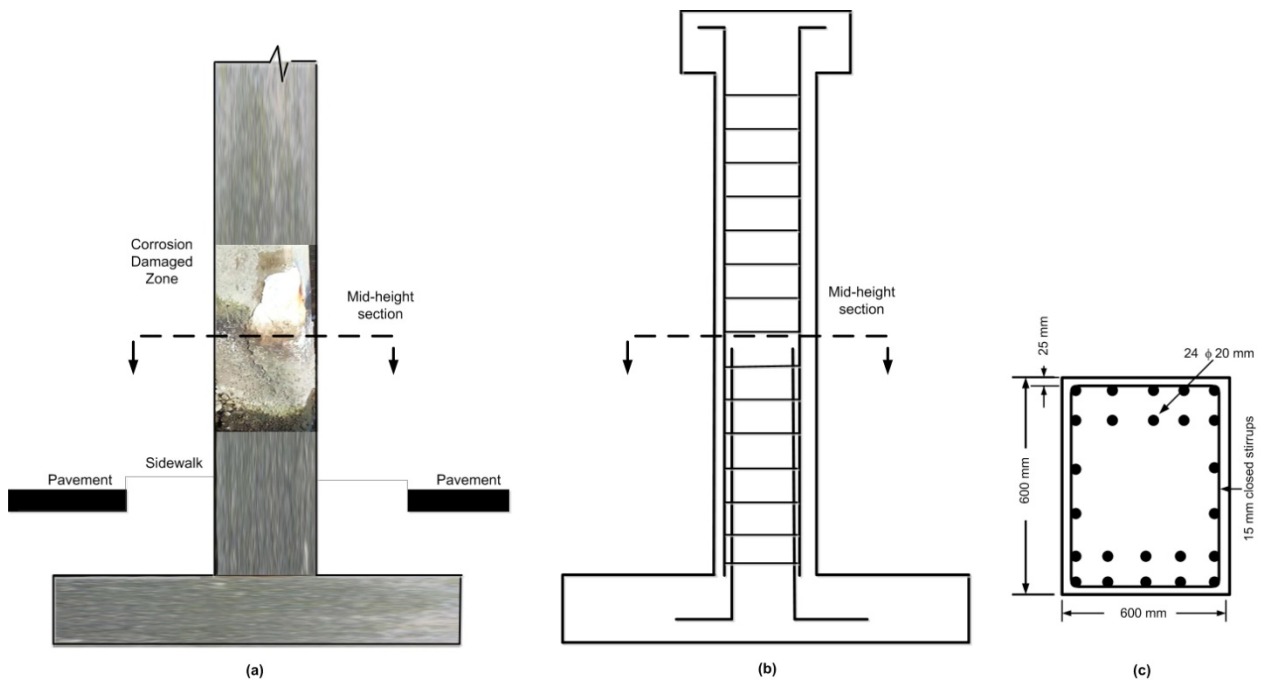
b-ii: Case study V: (a) most affected corrosion zone on a slab-on-girder bridge column; (b) column reinforcement and location of mid-height section; (c) column cross-section details.
